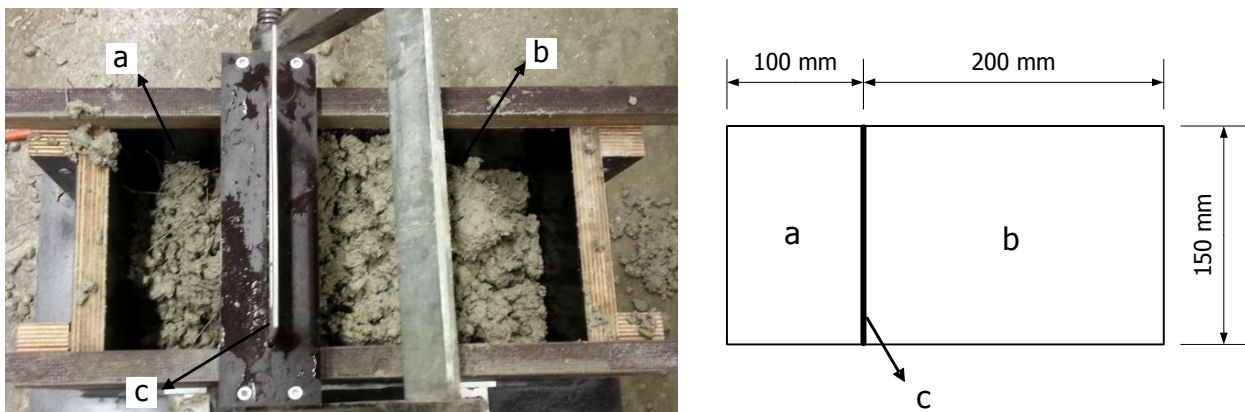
Special formwork for the production of hybrid concrete specimen: a) steel fiber-reinforced concrete (SFRC); b) plain concrete (PC); c) temporary partition steel plate
